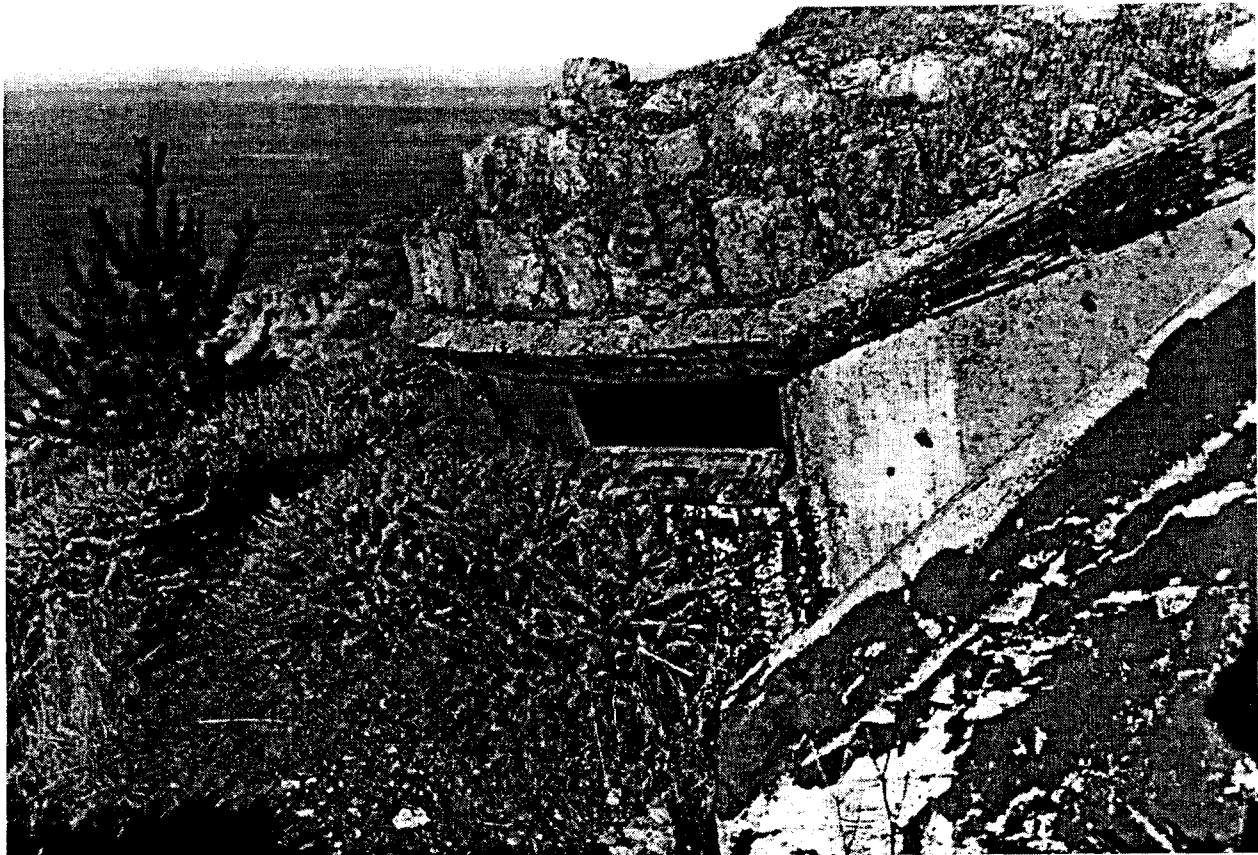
B¹S¹ for Battery Construction #129, Fort Cronkhite. Detail of roof camouflage and observation slit shutters. Subsidence at site.
